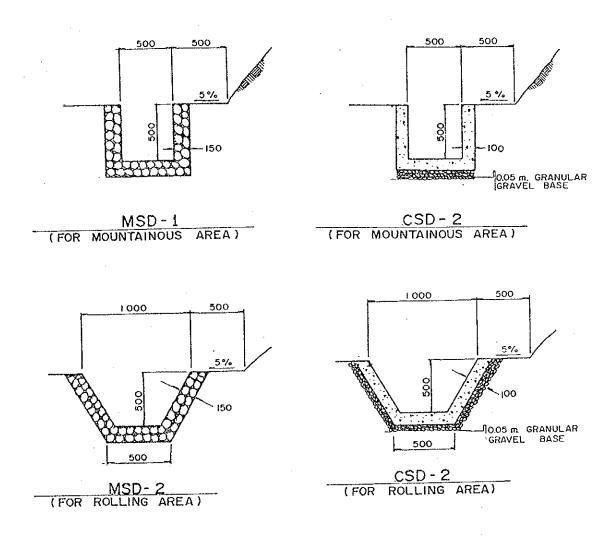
TYPICAL CROSS SECTION OF SIDE DITCH
